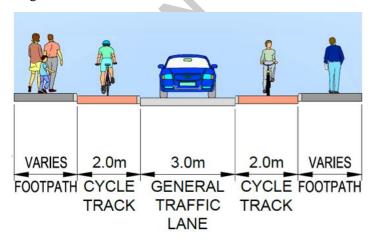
Section 2, Proposed Option 4 - Cross Section B-B
